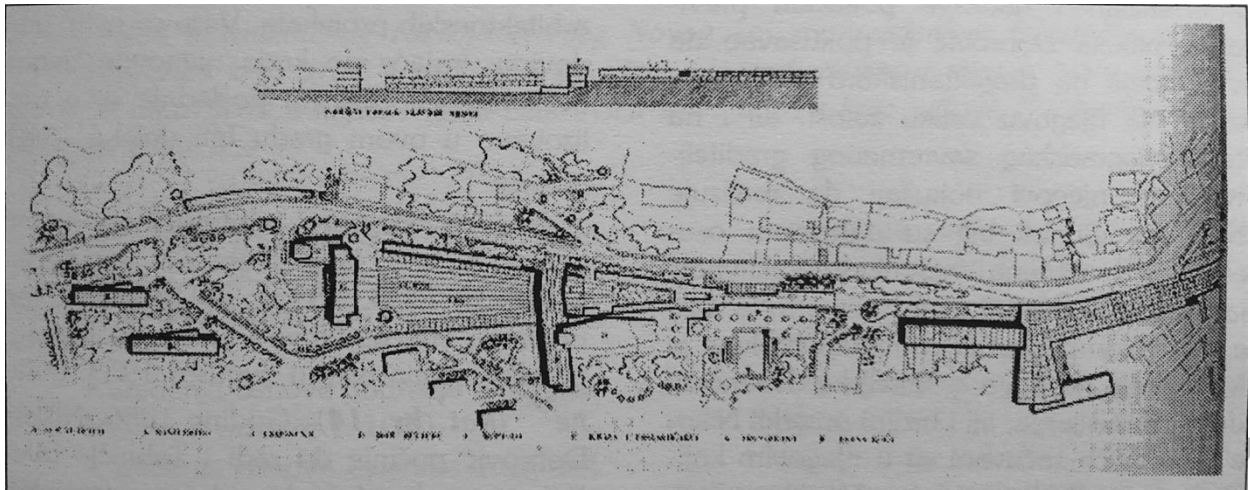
Plan of Herceg Novi center (source: SASA Archives, Historical Collection 14878/II)
